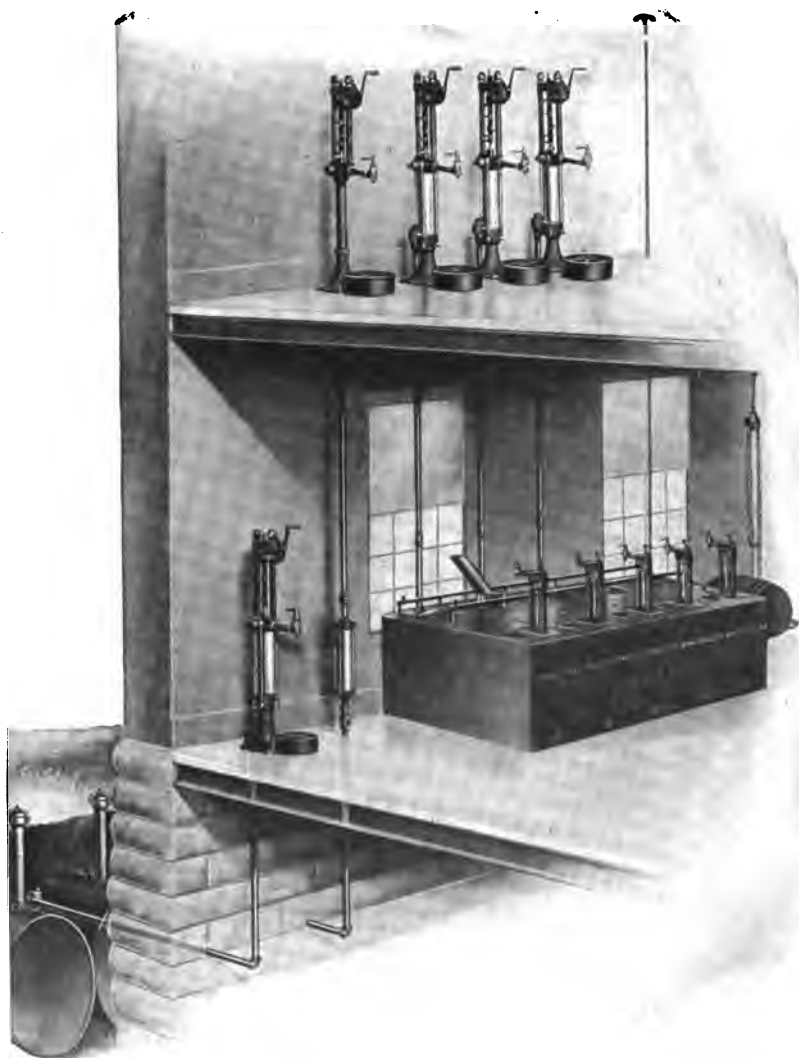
SEC. 9a.—Hand operated, two floor oil handling equipment.
